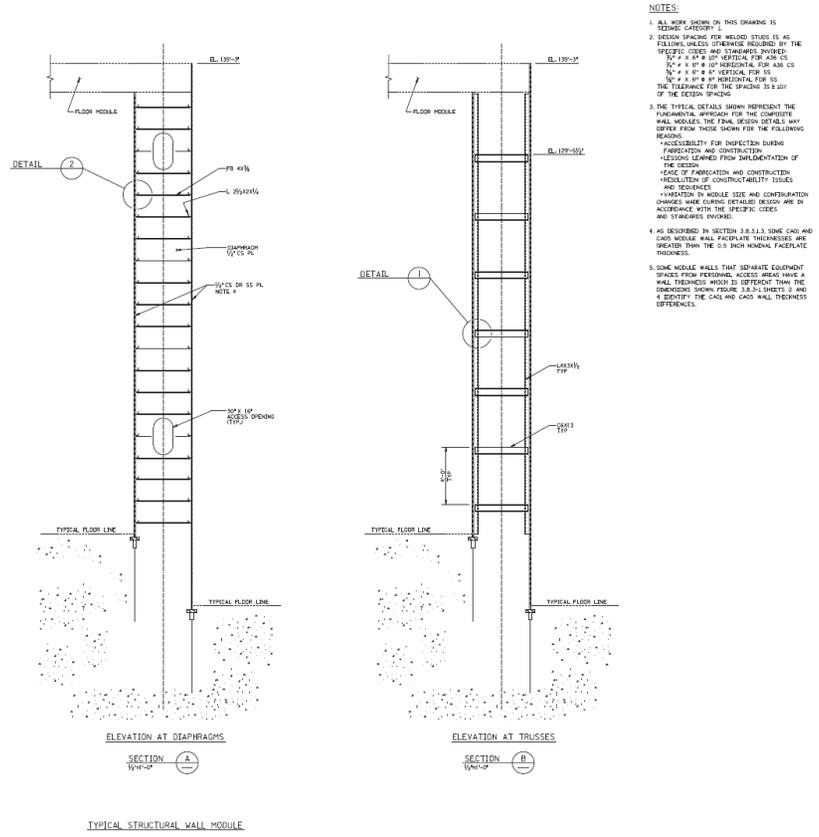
(Sheet 1 of 3) [Structural Modules – Typical Design Details]
